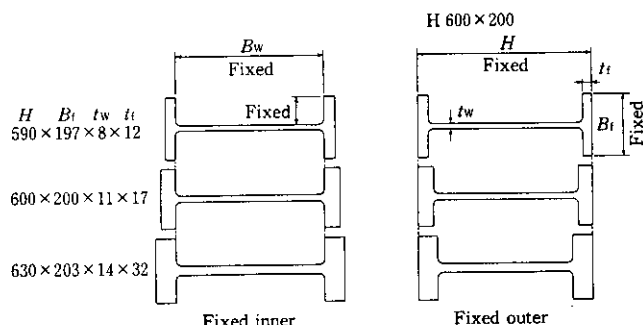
Comparison of fixed inner and outer dimension H-shape
